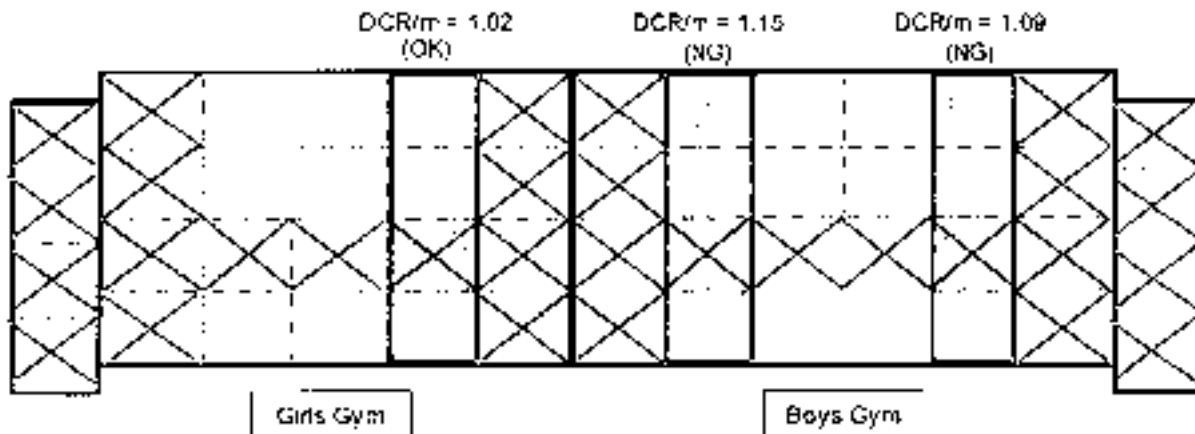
Building E, Diaphragm Deficiency at Roof Level
